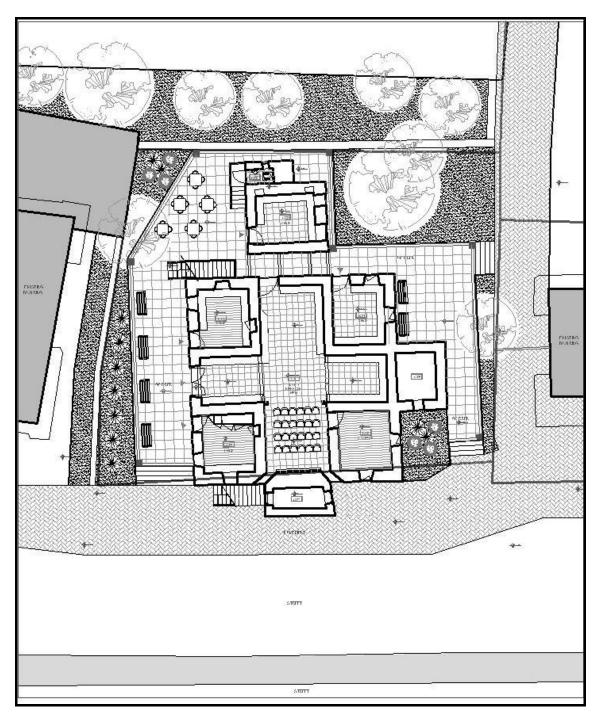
Conservation Proposal of Hasanağalar House – Ground Floor Plan
